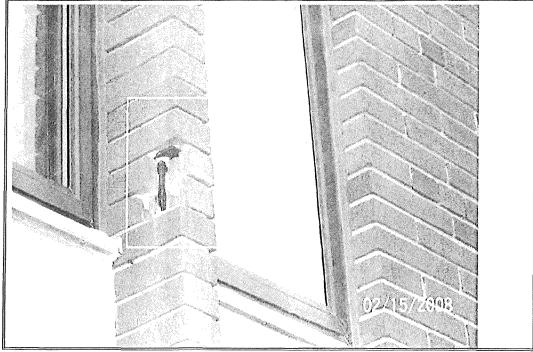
Photograph Number 8: Apparent face brick veneer spalling at the east side chimney.
